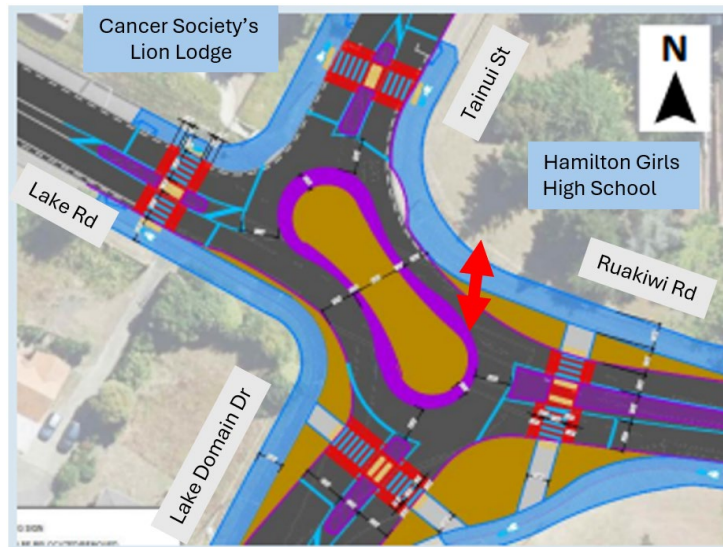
Concept layout for dog bone or peanut roundabout at Lake Domain Drive, Ruakiwi Road and Tainui Street intersection
